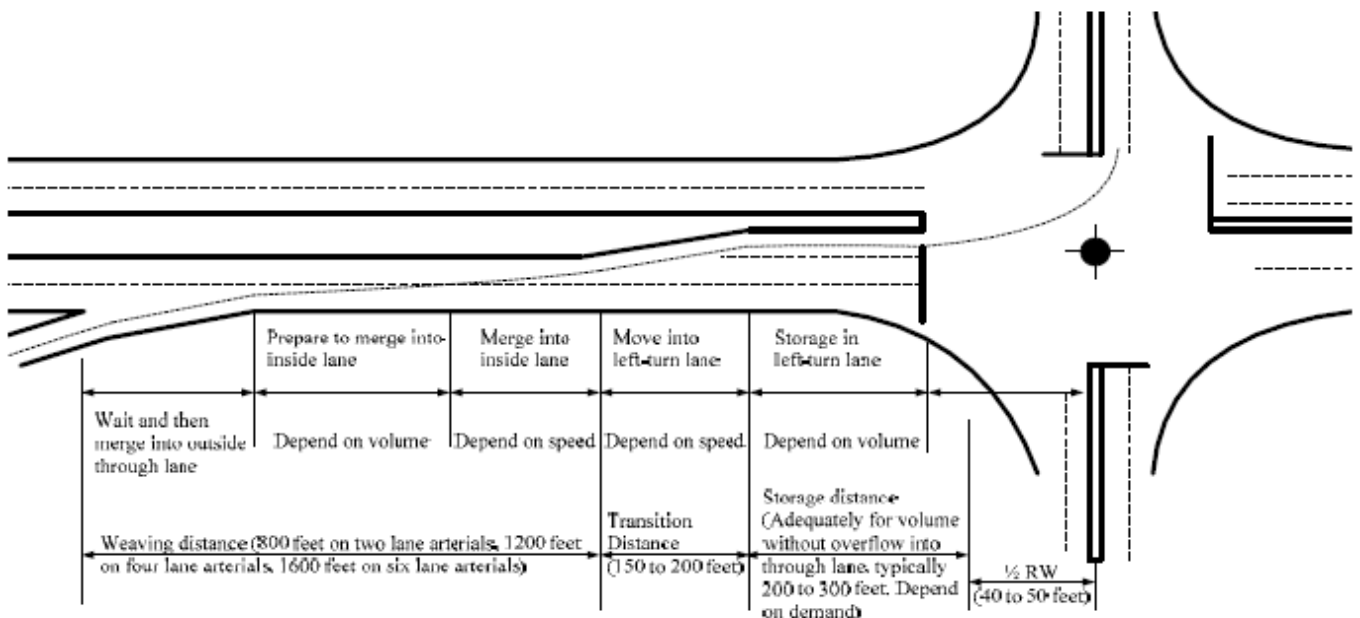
Distances between Ramp Terminal and Downstream Intersection
